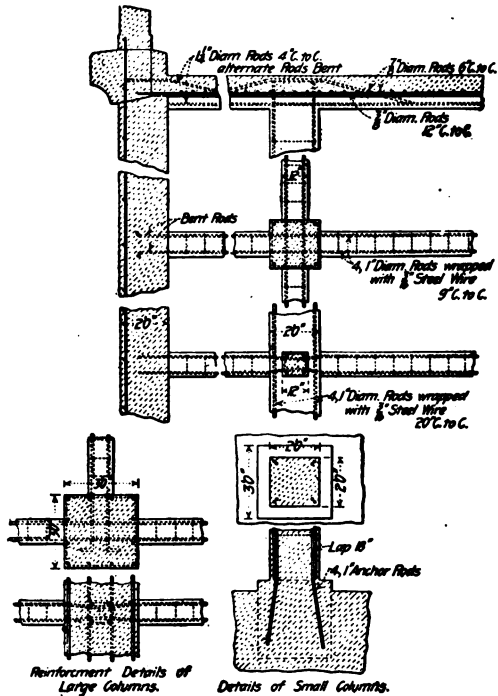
Interior Spandrel Construction, Piney Creek Bridge.
